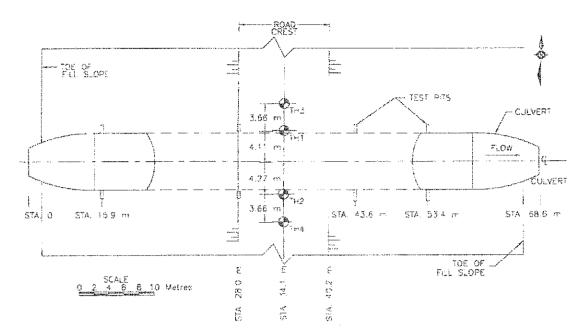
Bald Mountain Creek culvert - plan and test hole locations.
